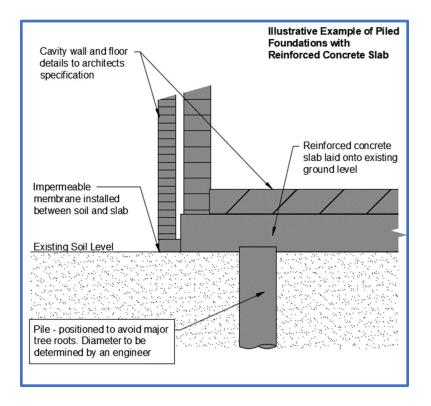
Illustrative example of piled foundations supporting an above ground reinforced concrete slab
